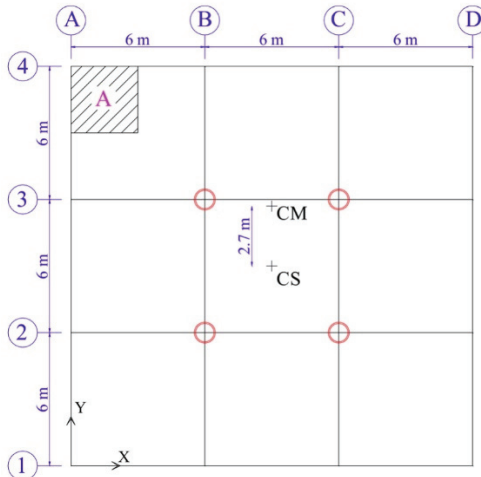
Model M1's plan modified to generate its corresponding Type 1 asymmetric building (i.e., model M13).
